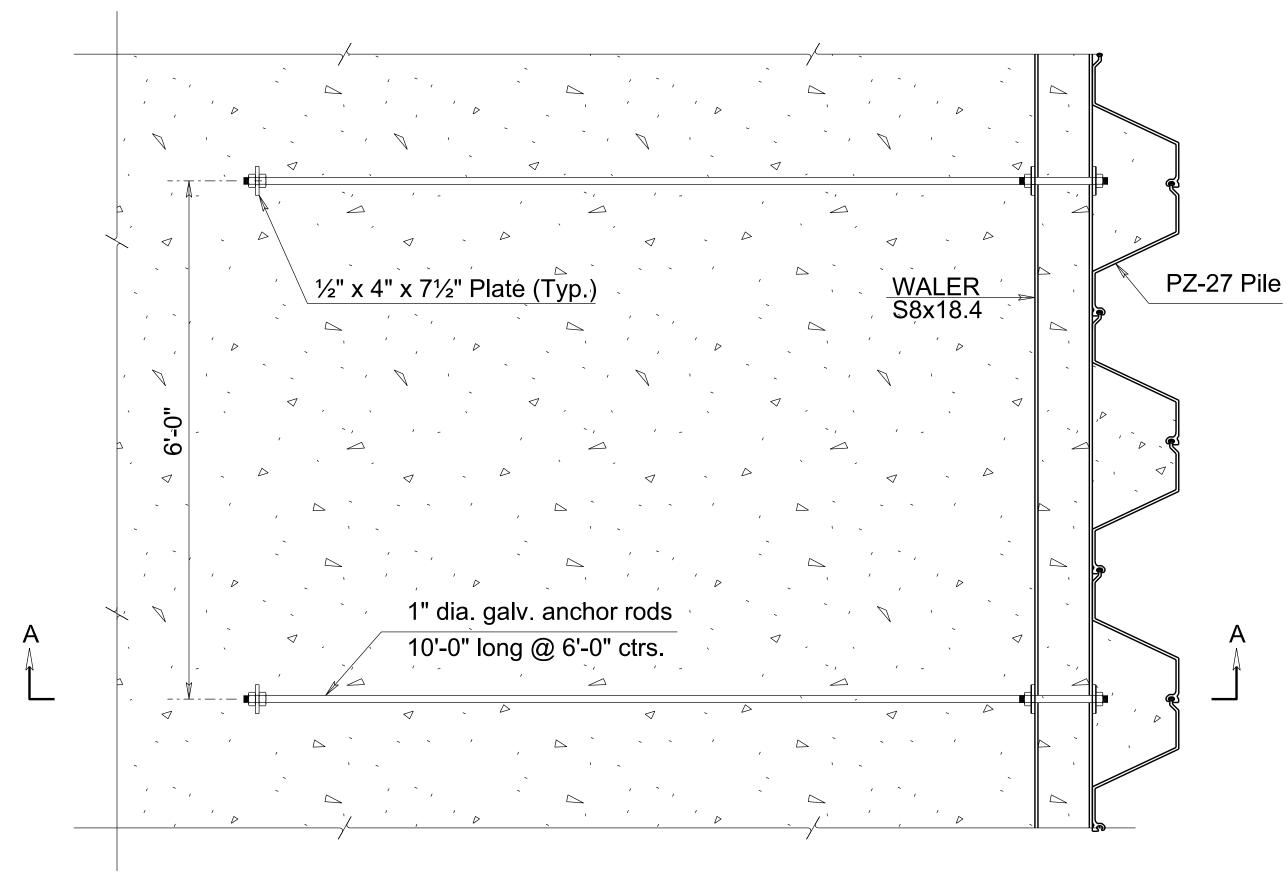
SHEET PILING DETAIL (PLAN VIEW)
